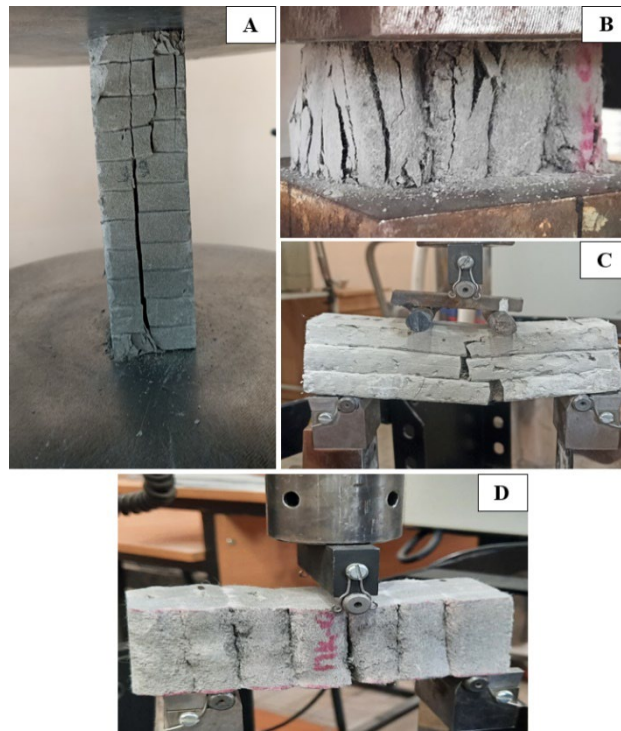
Strength tests of 3DPLC-samples: (a) uniaxial compressive test (Y-axes); (b) uniaxial compressive test (X-axes); (c) four-point bending test (Y-axes); (d) splitting three-point bending test (X-axes).
